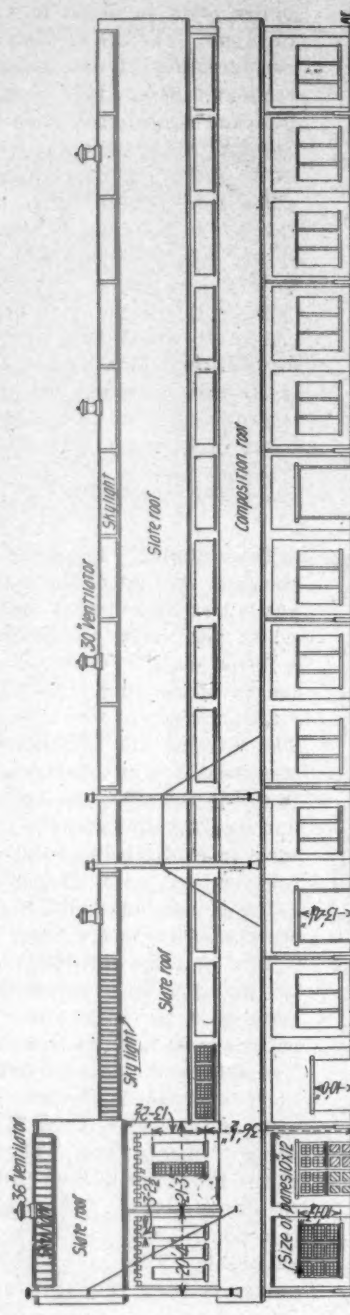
Boiler Shop—Side Elevation Showing Riveting Tower.
